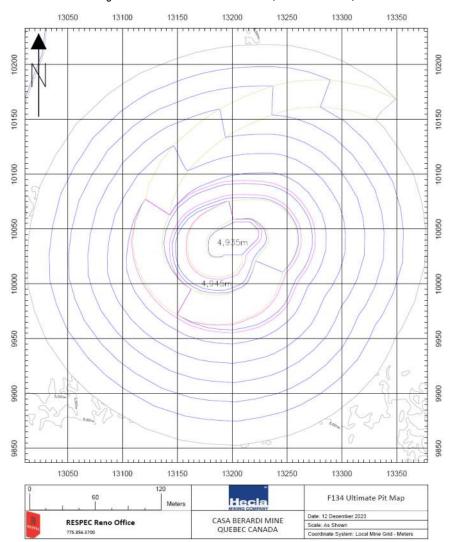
Plan View of the F134 Pit (Ultimate Pit Shell)
